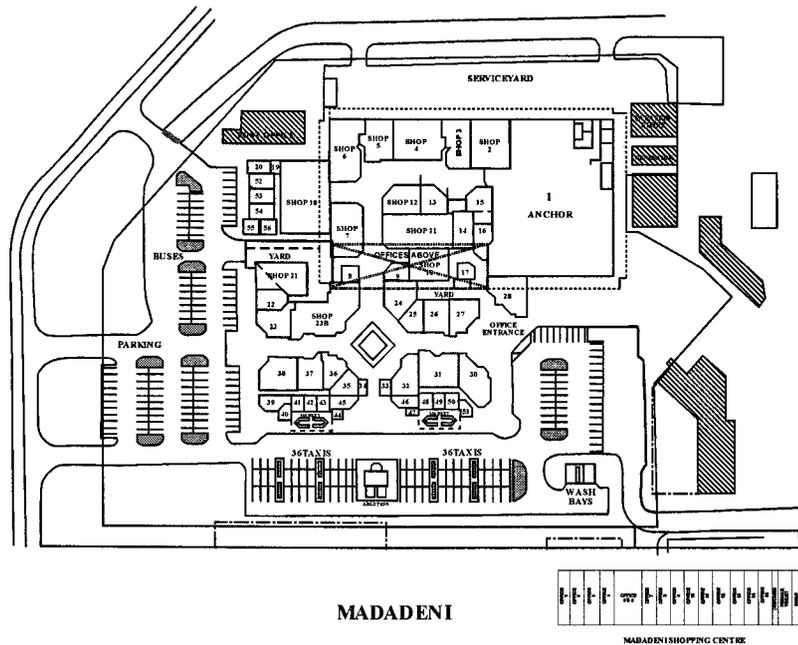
Madadeni Shopping Centre floor plan Shops 1 to 17 is located in the original building.
